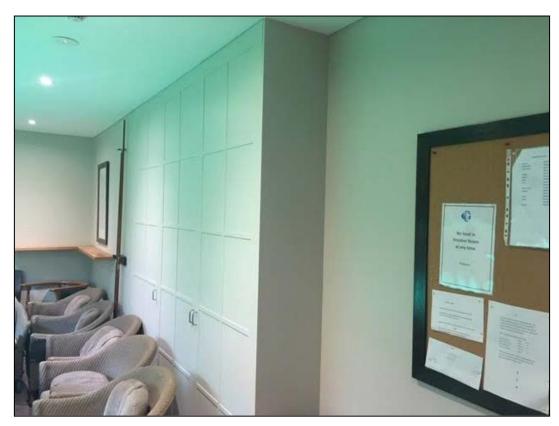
The wall between the snooker room and the bar will be removed. Again this wall is not structural.
